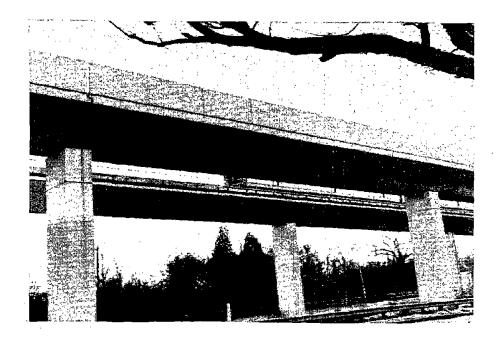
MARTA ELEVATED STRUCTURE WITH CONCRETE BOX GIRDER
